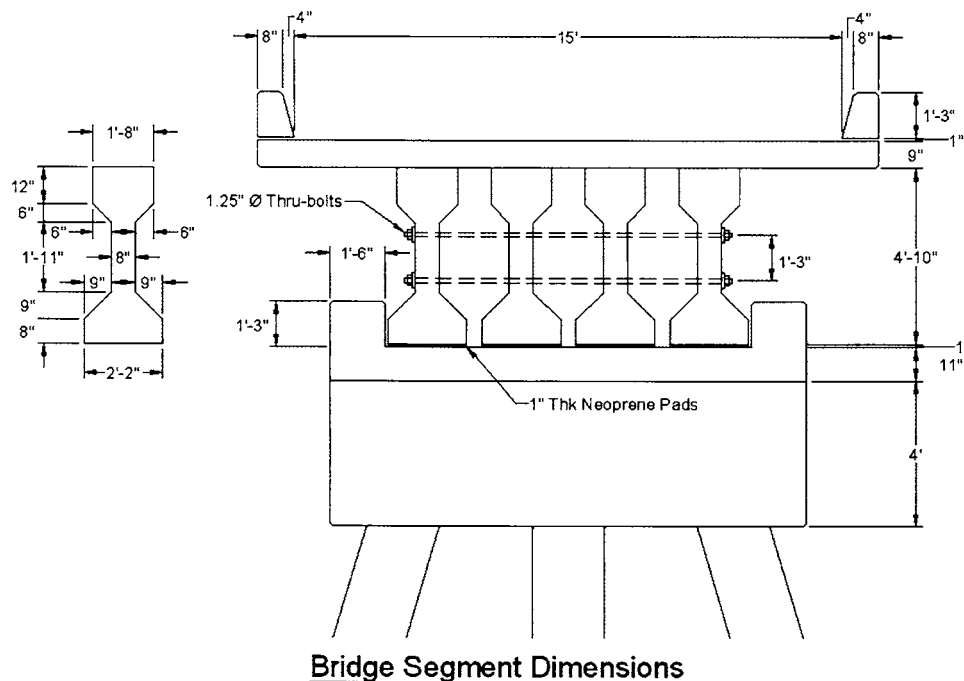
Cross-section details of railroad bridge over Biloxi Bay (1 ft=0.3048 m)
